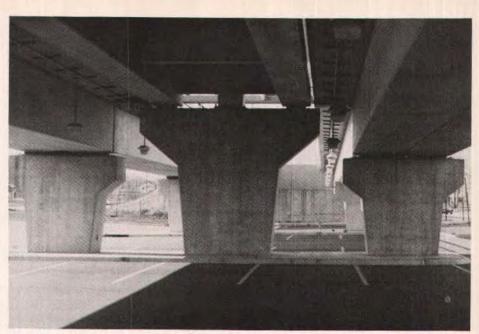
Underside view of Long Island Railroad grade crossing elimination, Massapequa Park Station, New York.
